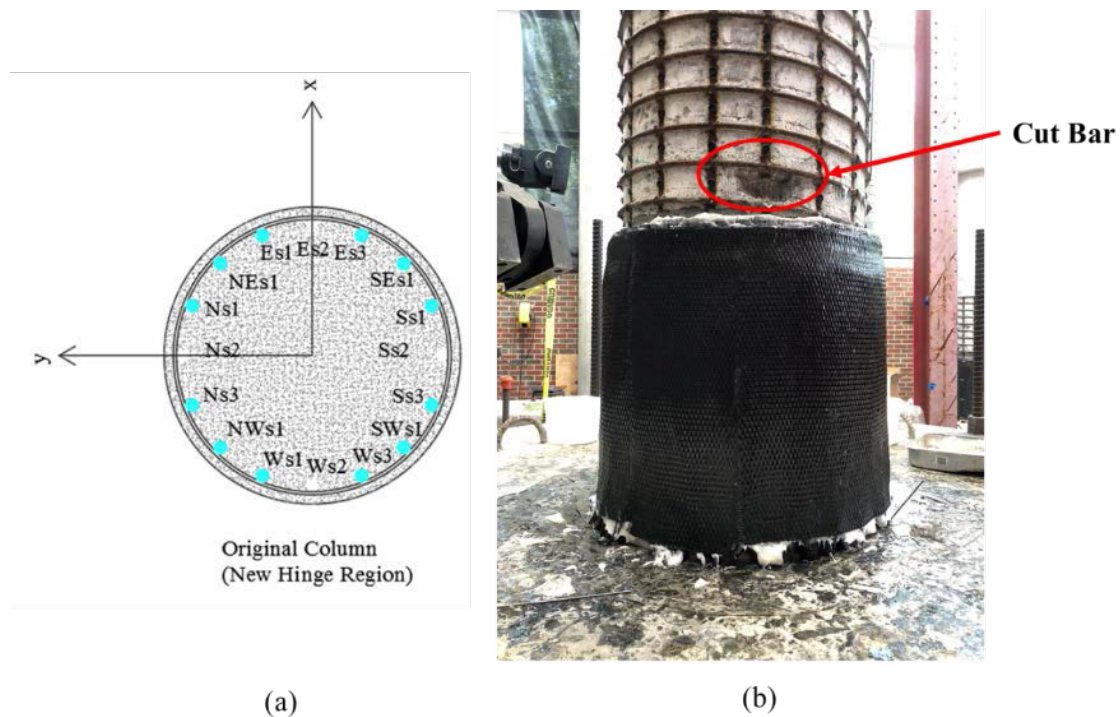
a) Designation of Reinforcing Bars in C2 Column Specimen b) Location of Bar Cut
